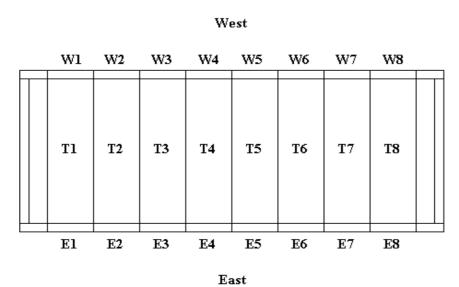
Plan of the test house in Trondheim, showing the location of the wall and roof test elements.
